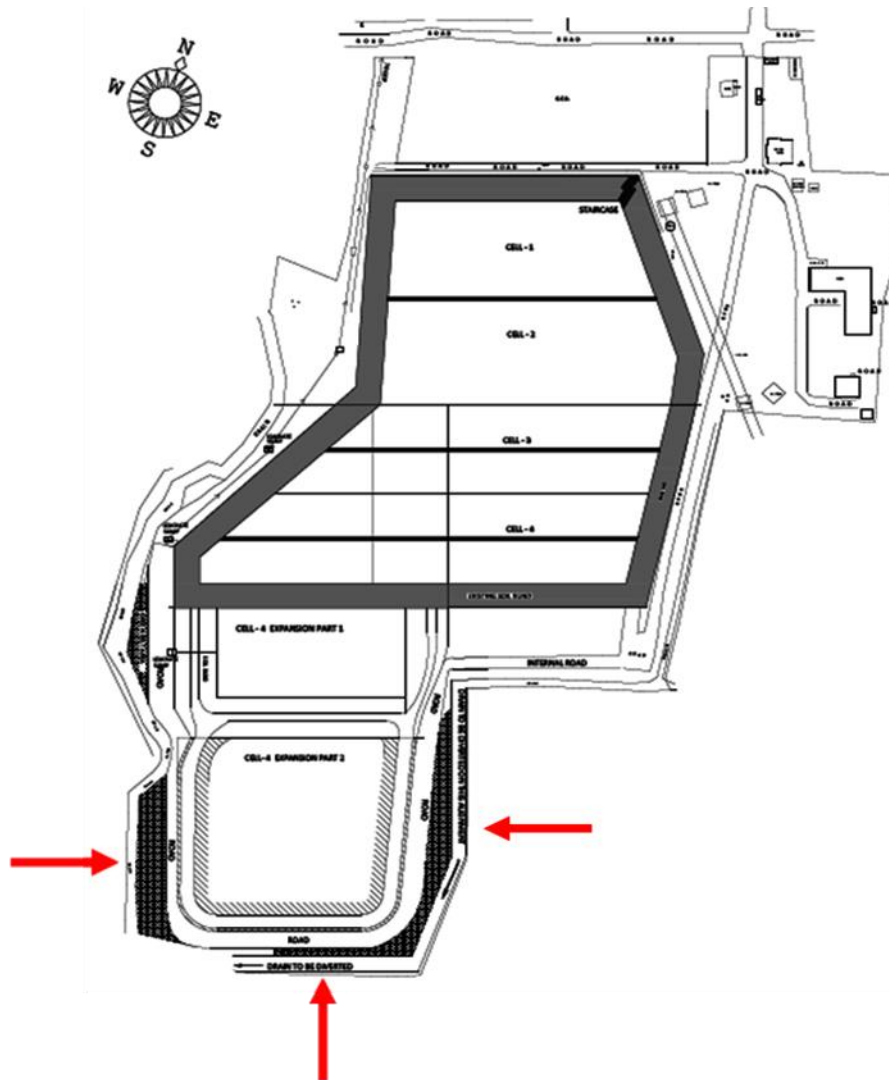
The reinforced soil wall section resting directly on the ground, marked by arrows
